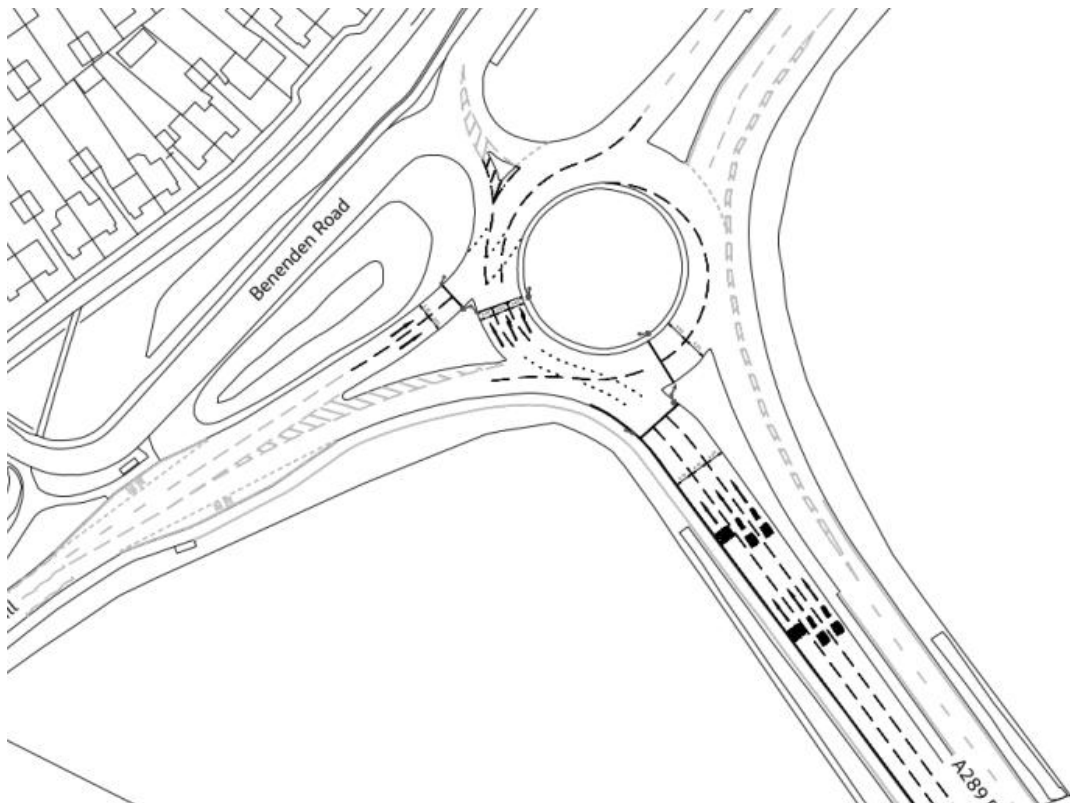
Proposed Jacobs Interim Layout – Sans Pareil Roundabout
